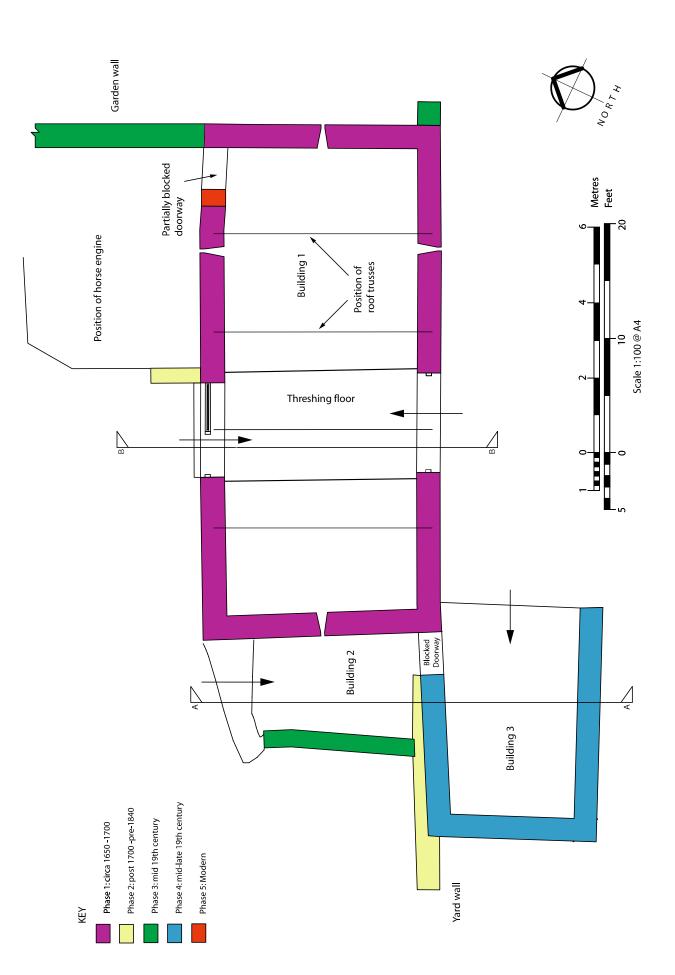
The Threshing Barn and attached buildings (Buildings 1,2 & 3), plan showing building phasing.
